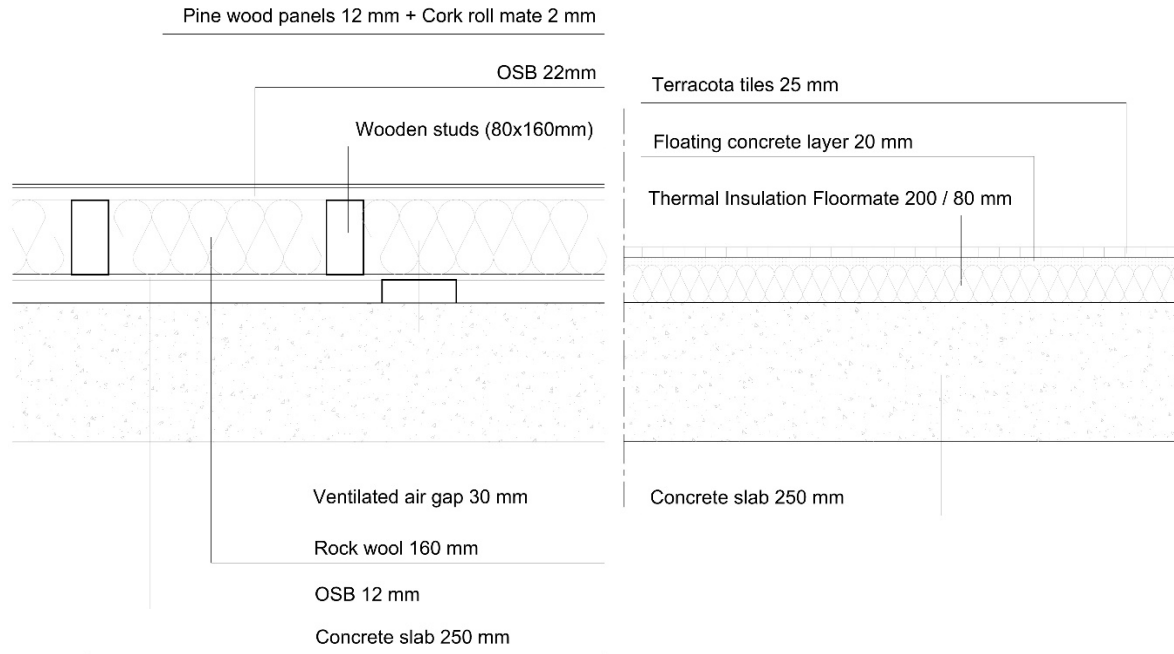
Details of constructive solutions 1 and 2 (adapted from: Atelier dos Remedios)
